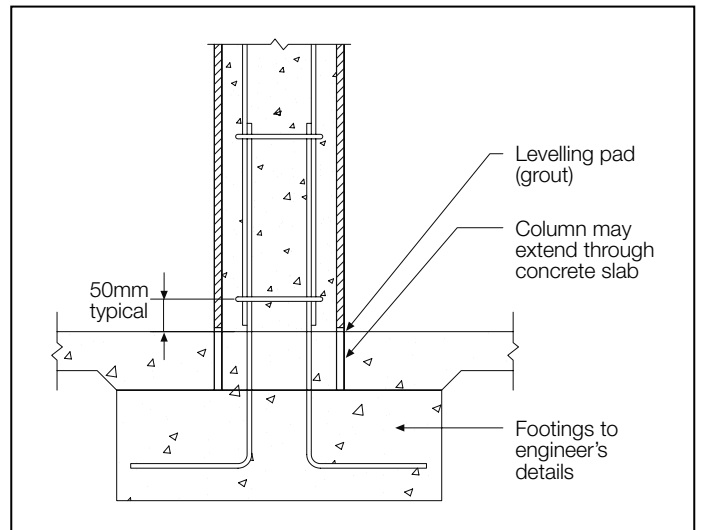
TYPICAL FIXED BASE ARRANGEMENT
